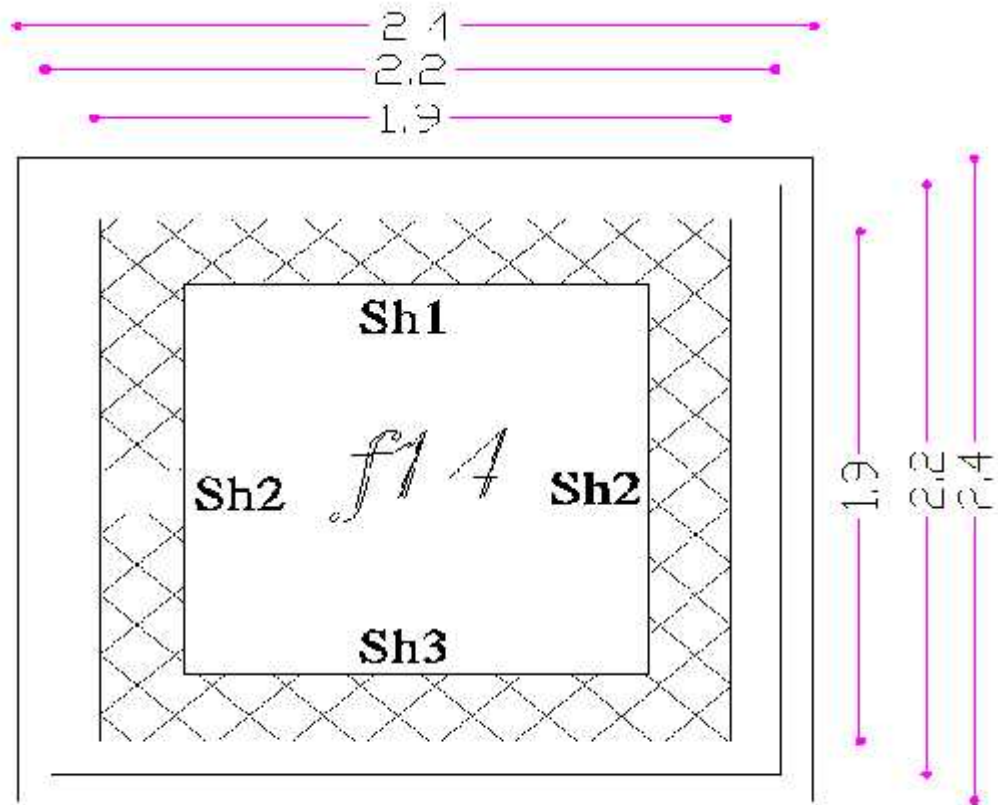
Top view of Mat Foundation(Under Elevator)
